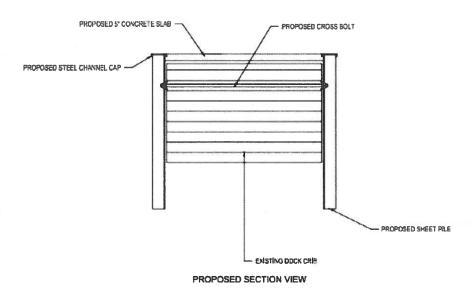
Section view of proposed dock encapsulation. (Courtesy of MJO Construction)
